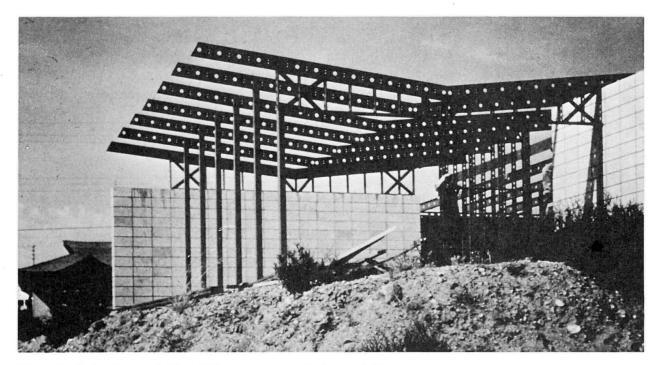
Cold-Formed Steel Framing: Joists and Studs
